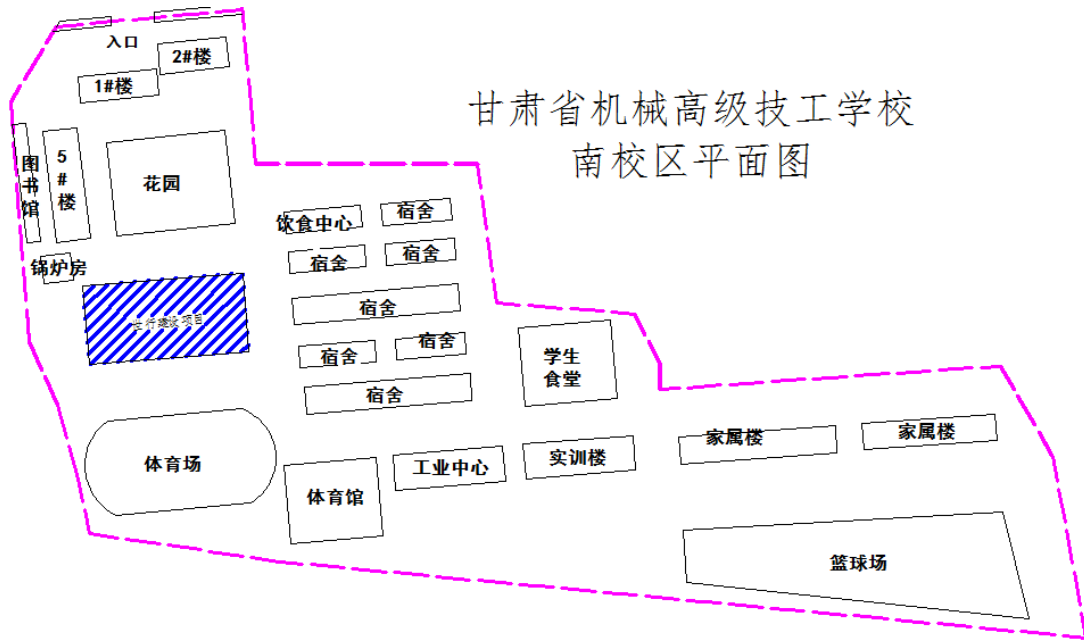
Site plan Gansu Senior Machinery Vocational School
